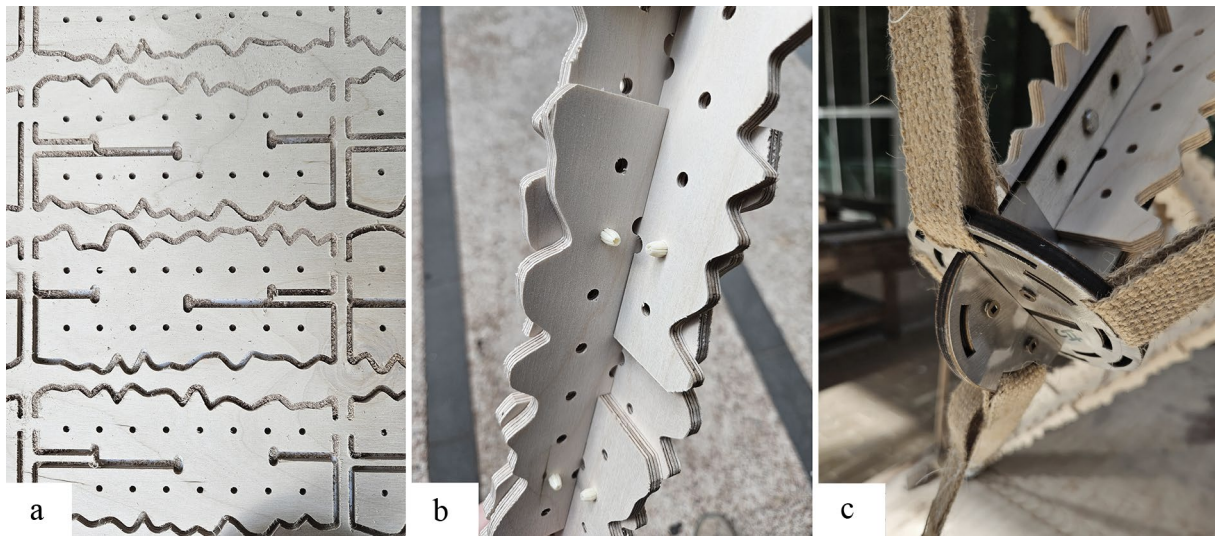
Strut design and construction: (a) Fabrication of subcomponents; (b) Assembly and overlapping of subcomponents; (c) Joint design [Photographs: J. Halls]
